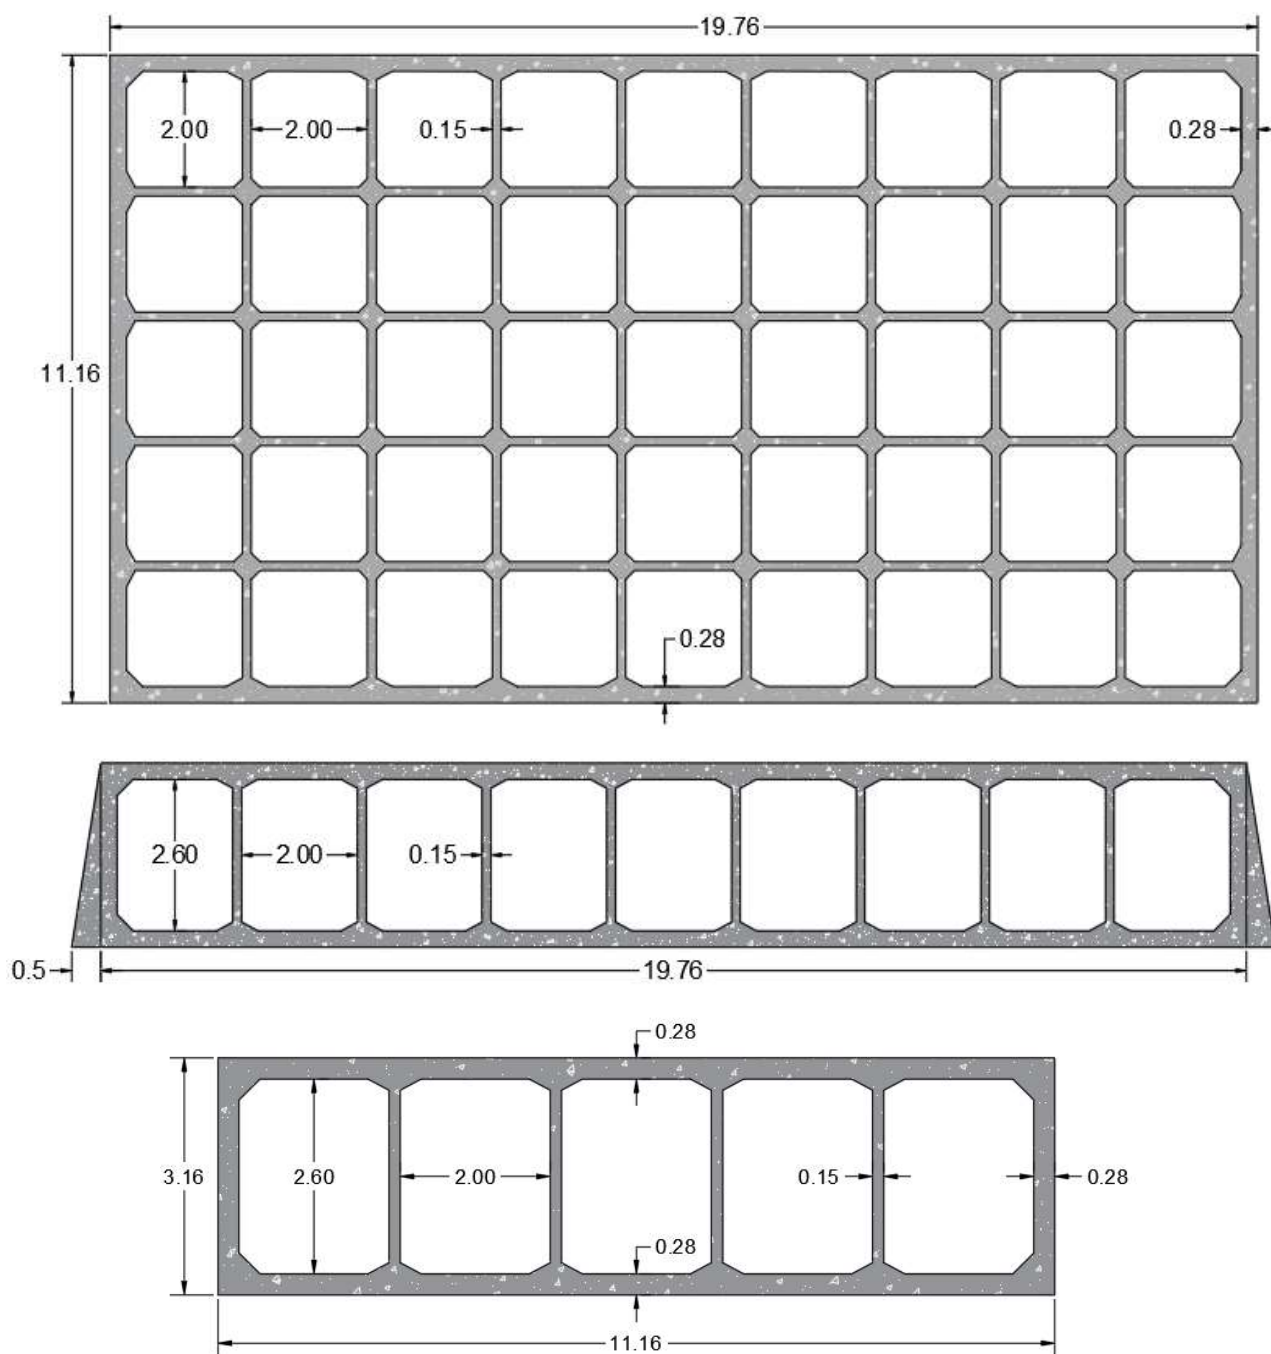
Plan, longitudinal section and transversal section of the designed anchor
